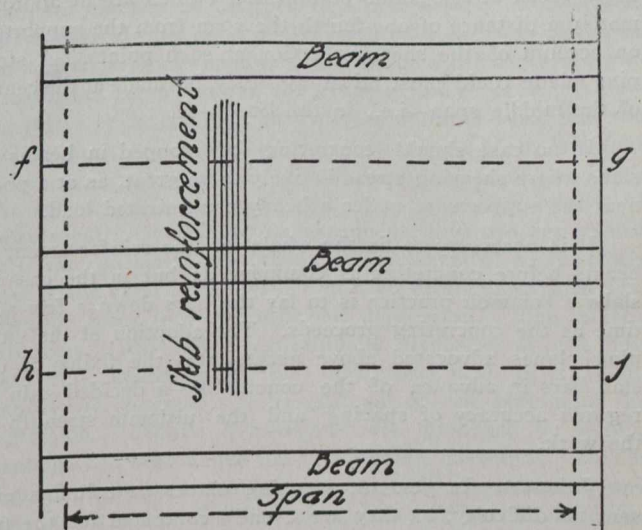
Beams Running in One Direction Only—Beams and Slabs Cast as Units—Planes Midway Between Beams.
